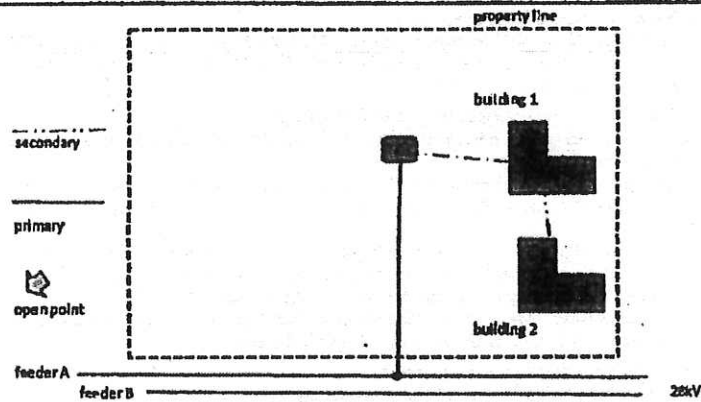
2 BUILDING CONNECTION less than 1,000kVA
